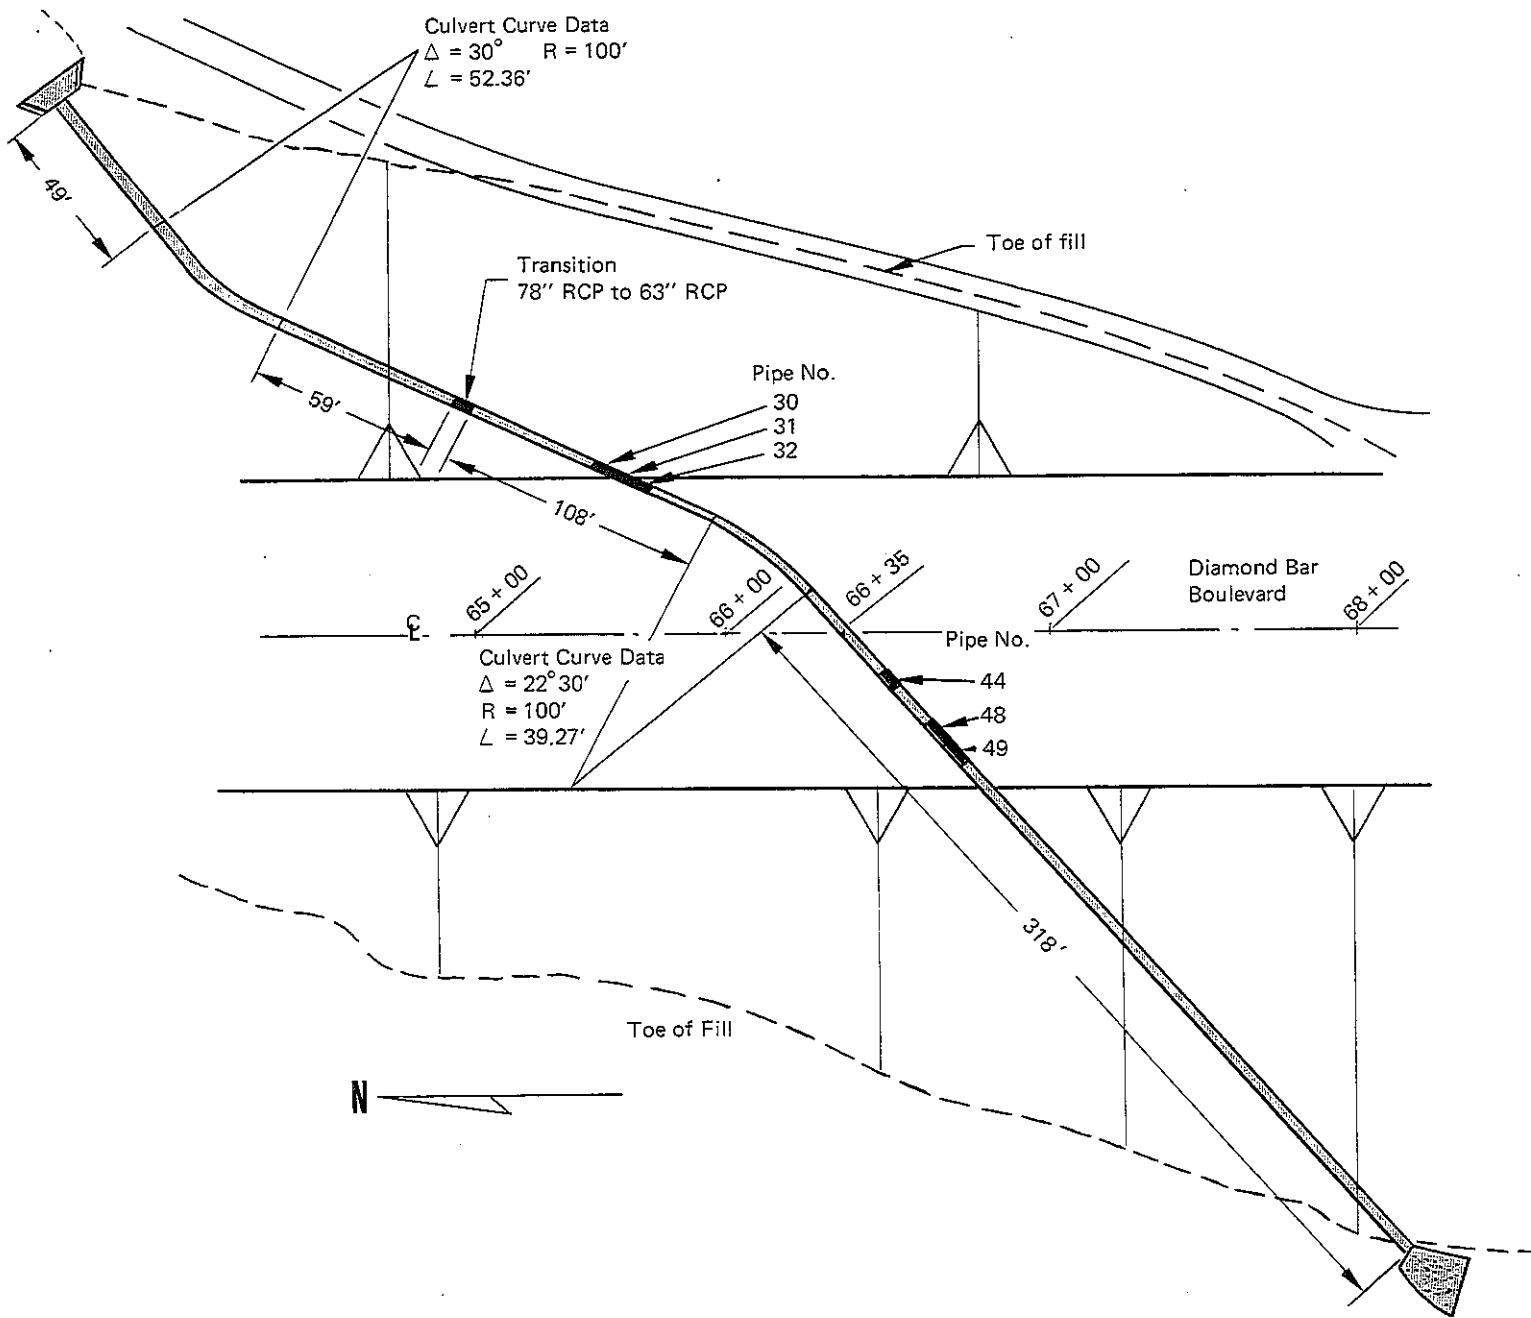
DIAMOND BAR BOULEVARD — CULVERT PIPE PLAN VIEW.
